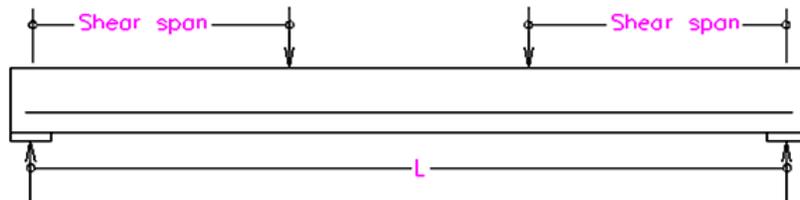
Traditional shear test set-up for concrete beams.
